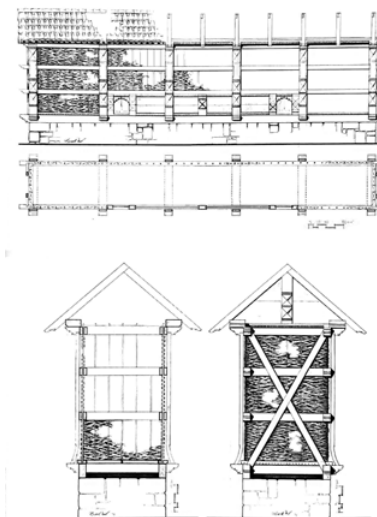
(right-up) Floor plan and front facade of M. Kurmehaj corn crib, Strelc, Deçan
